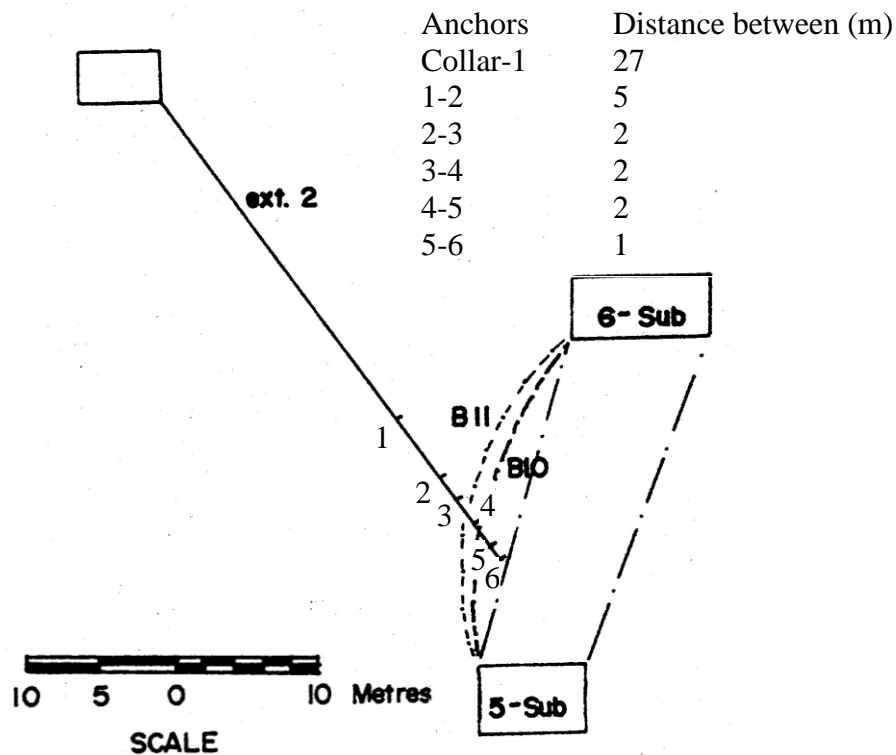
Cross section of the 16N stope at Brunswick mine showing the position of extensometer 2 anchors relative to the stope hanging wall before and after local sloughing (after Milne, 1993).
